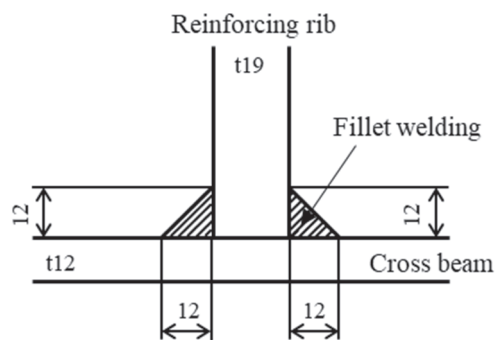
Welded part of reinforcing rib welded without groove processing
